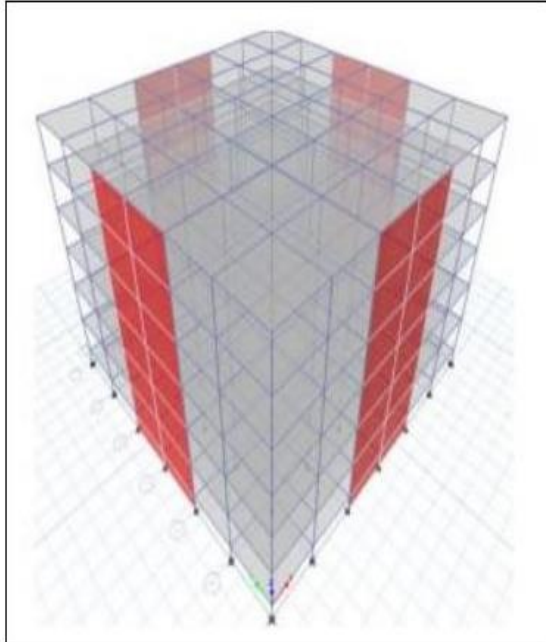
Multi storey building with RCC shear wall on Periphery at Centers
